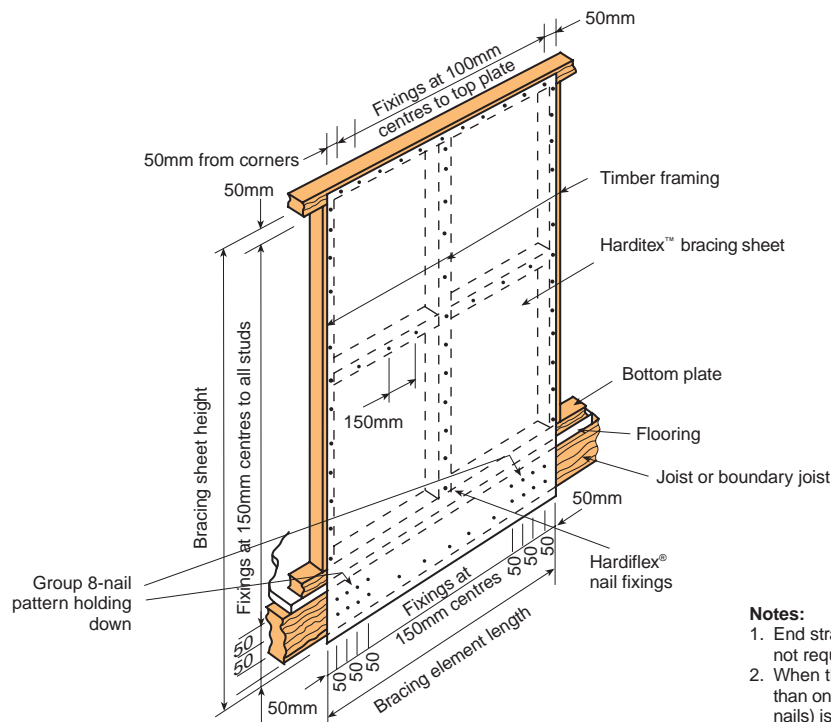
HARDITEXTM ON TIMBER OR CONCRETE FLOORS WITH END STRAPS
